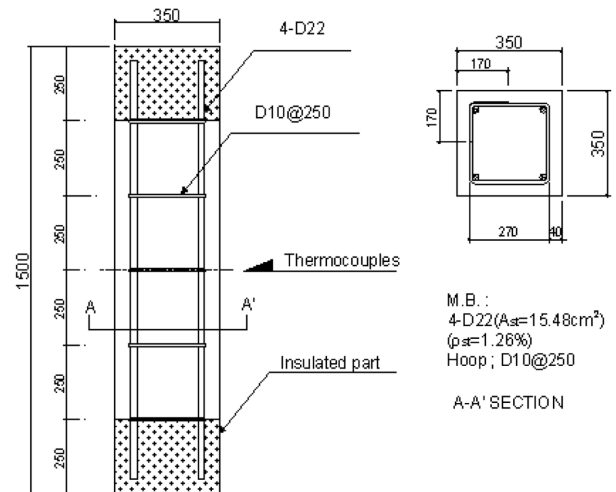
Elevation and cross sections of C11 column (unit: mm)
